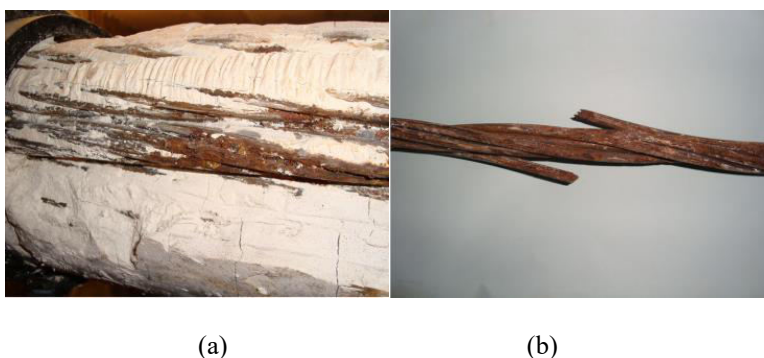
Prestressing bar corrosion in white grout body in extracorporeal prestress cable[16] (a)White paste-like substances isolated from grouting bodies (b) Rust-broken prestressing bars
